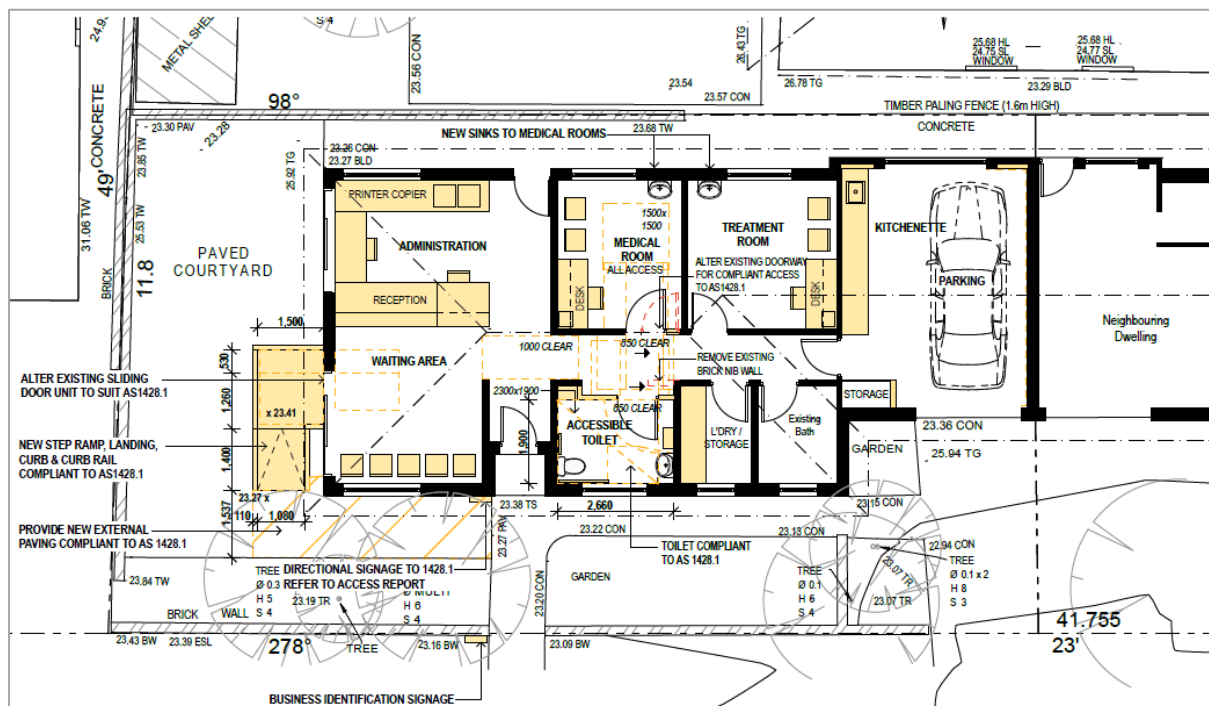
Proposed Ground Floor Plan, proposed works outlined in yellow (Source: AM Designs)
